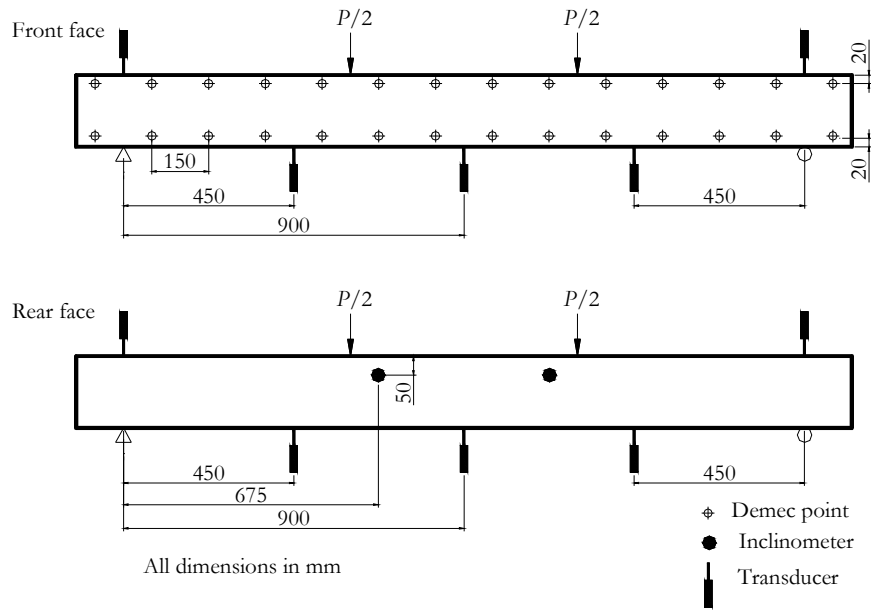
Instrumentation details for beam C1-216-D1-A.
